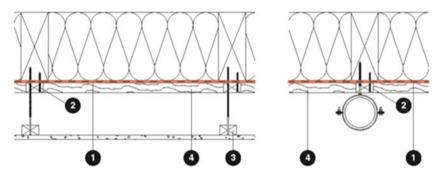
Suspension: (1) air barrier, (2) laths, (3) ceiling suspension, (4) loadbearing lath
